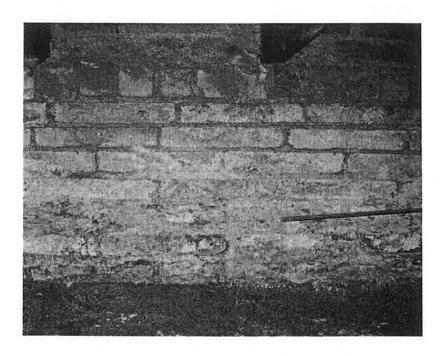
Figure L. West exterior bearing wall exposed footing with efflorescence and deterioration.
